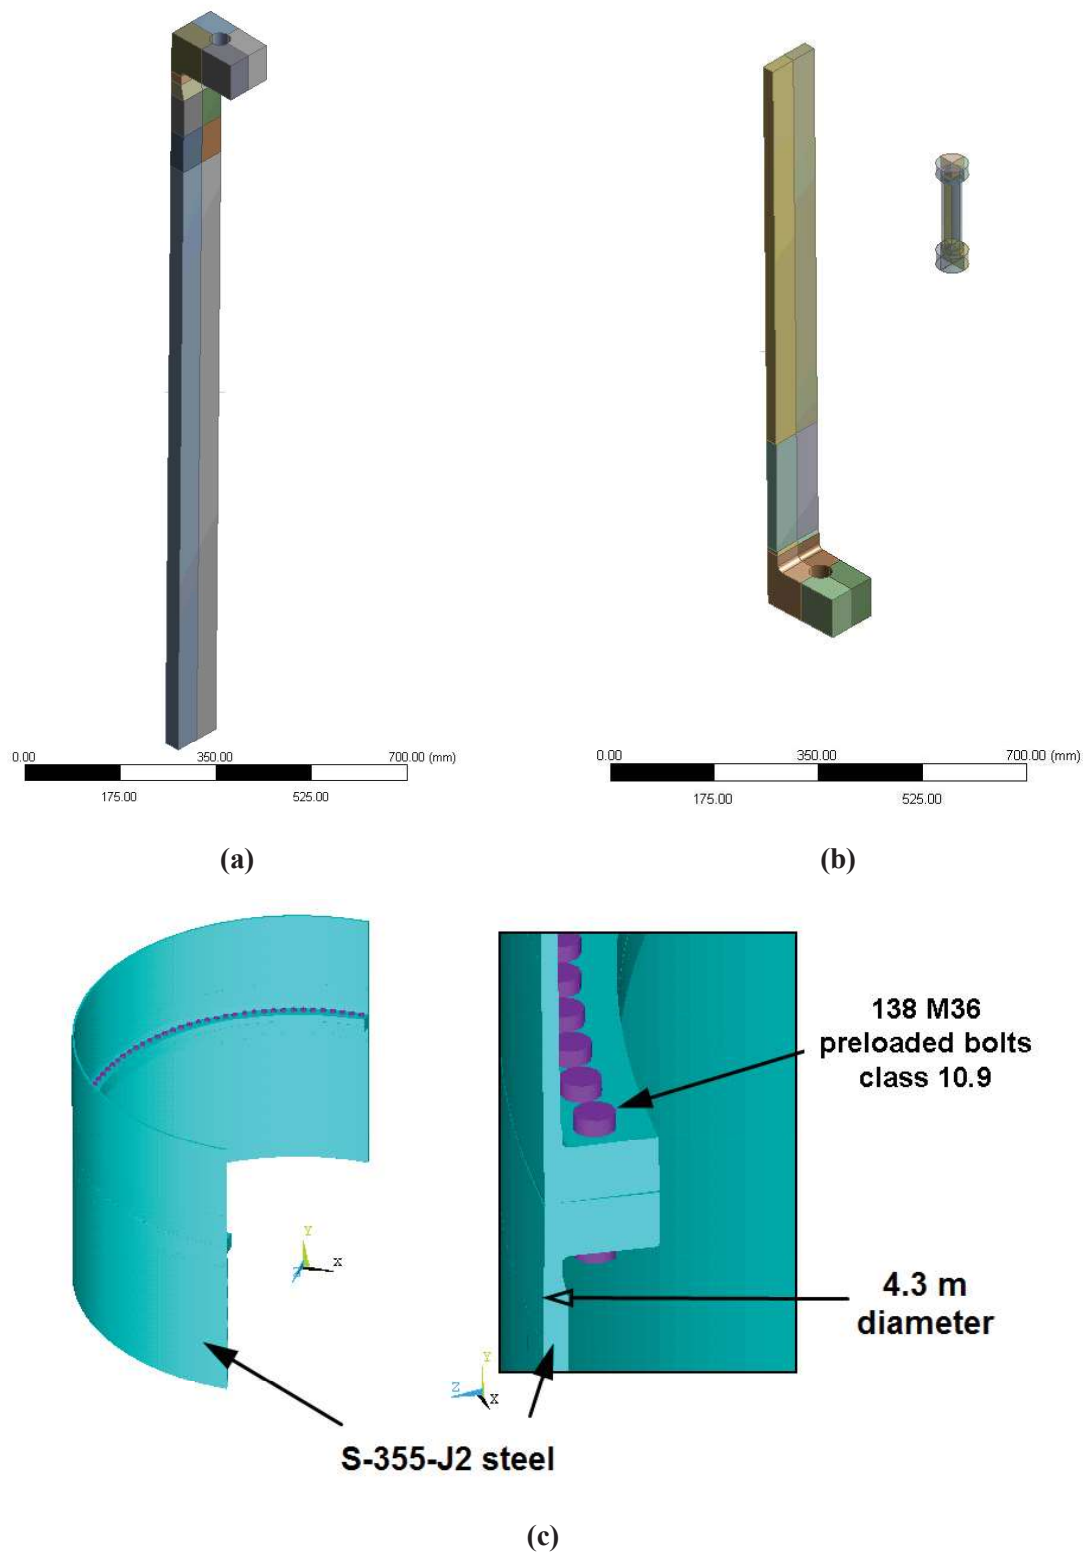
Geometric model: a) Lower flange; b) Upper flange and bolt; c) Complete (symmetry) model.
